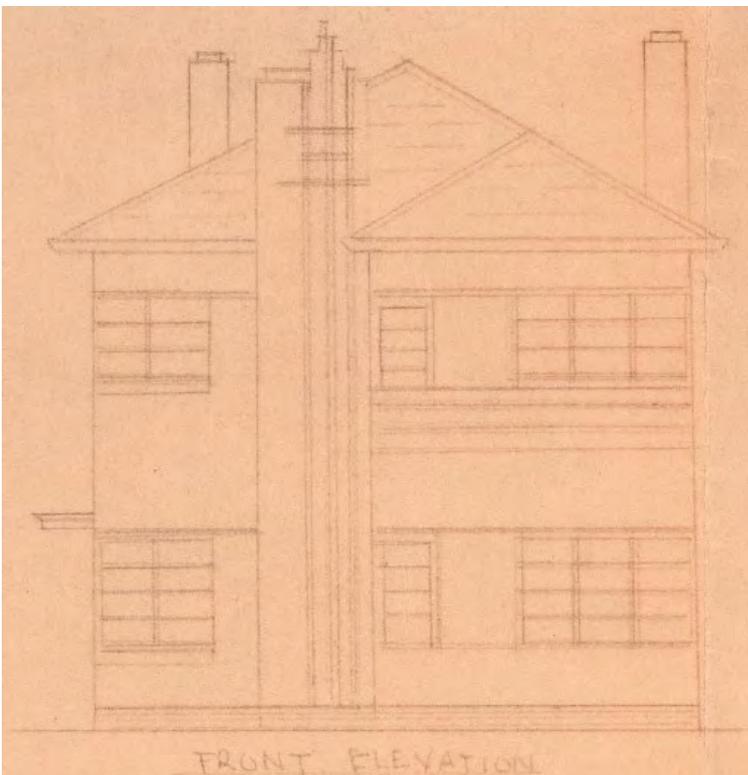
Original drawing, front elevation of 58A Westbury Street. (Source: Council building file)
